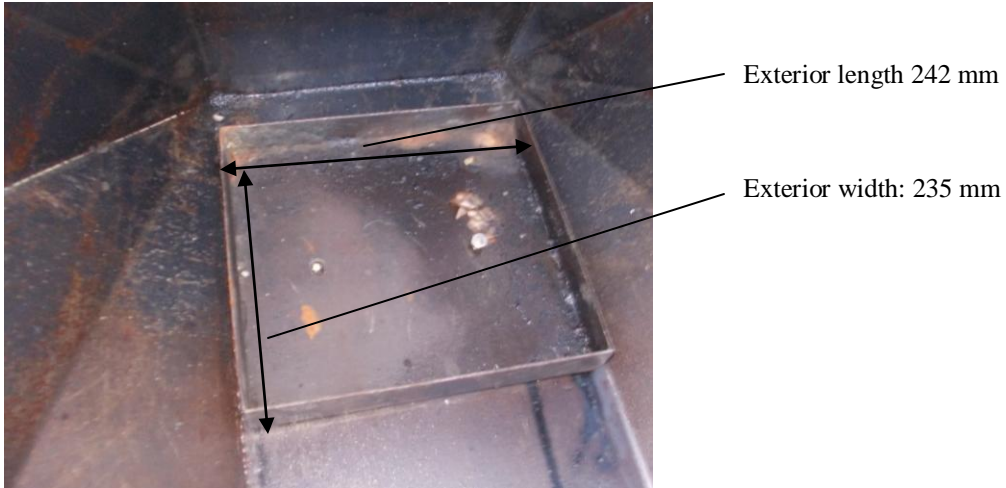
Mold of the rectangular hole in the funnel concrete piece
